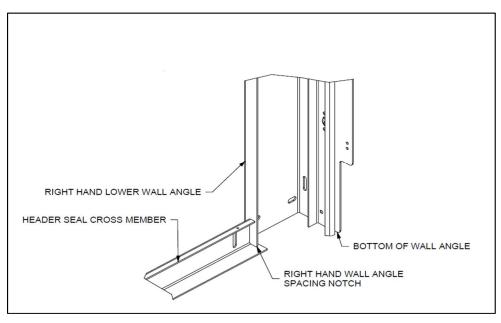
HEADER SEAL CROSS MEMBER INSTALLATION SPACER
